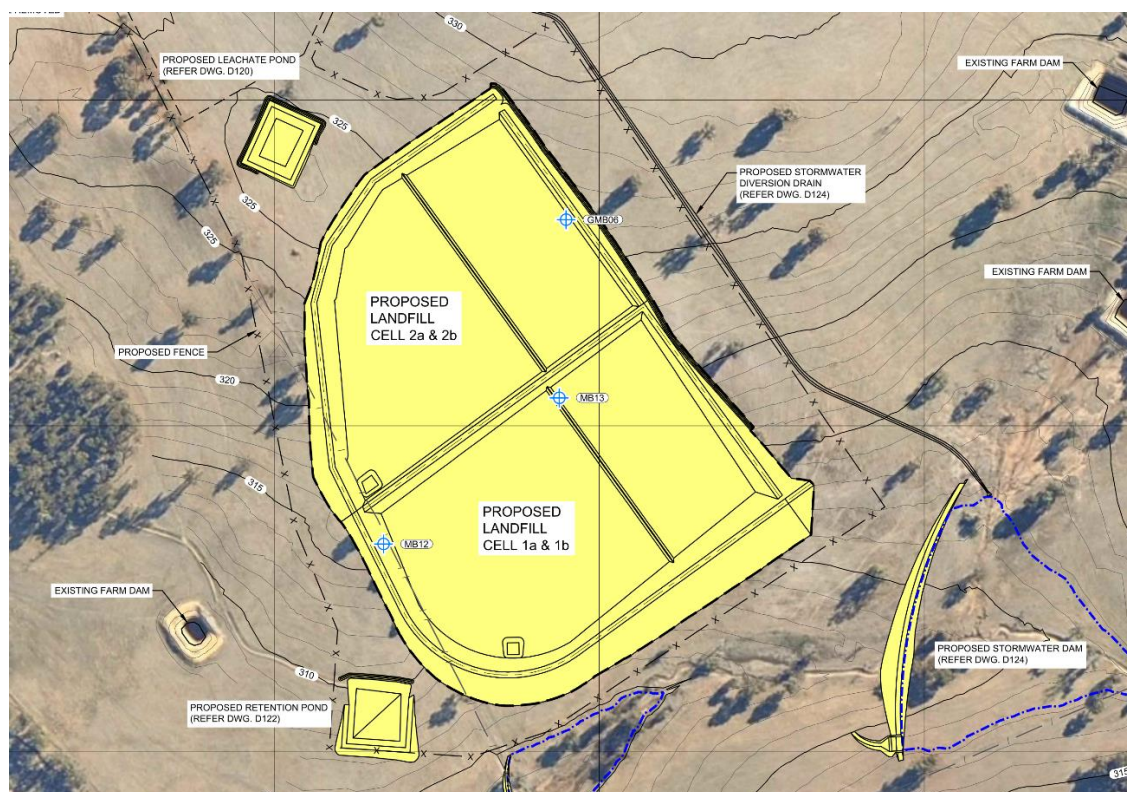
General Arrangement showing the location of the leachate pond, retention pond and stormwater dam (Golder, 2017d)
